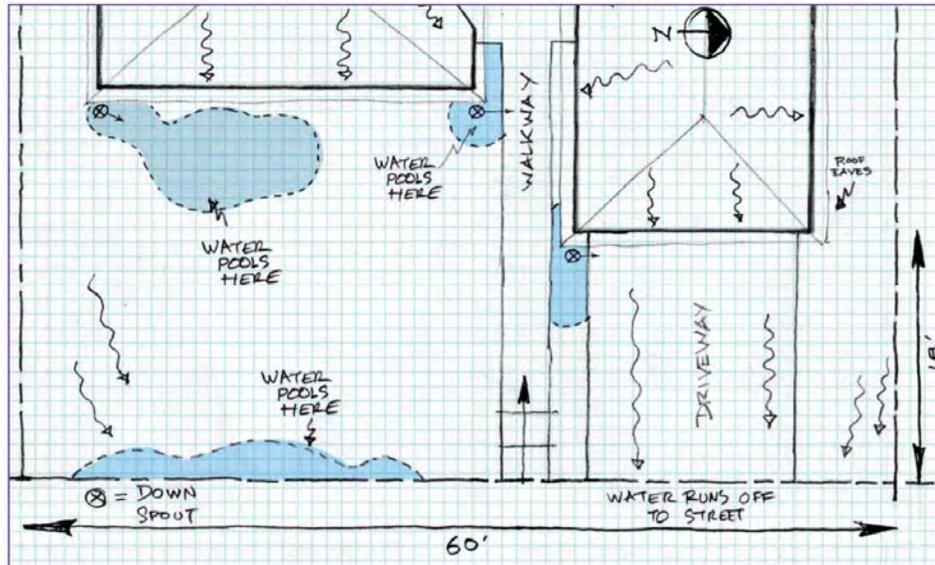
Single-Family Residential Lot Drainage Schematic.
